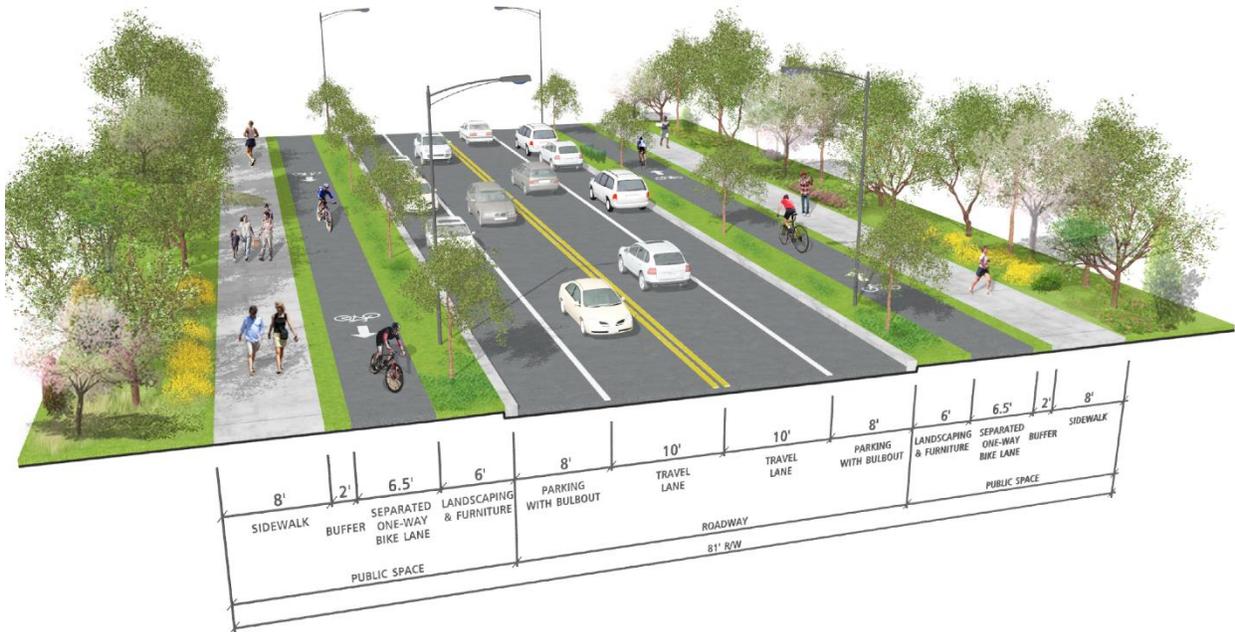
Proposed Typical Section for Addison Road and Columbia Park Road
